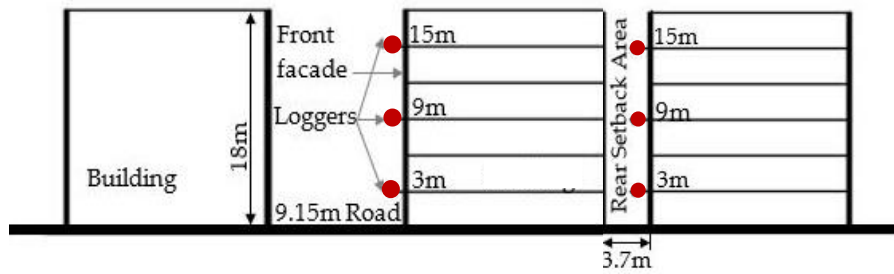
Section A-A: Loggers Installed on the Front Façade & at Rear Setback Area
